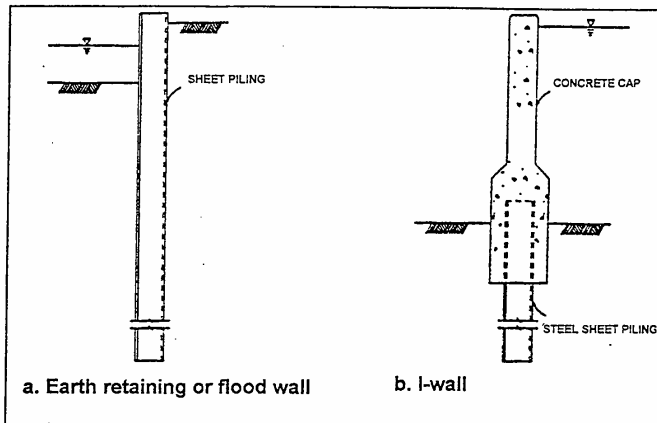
Cantilever walls (Source: COE Engineering Manual)
